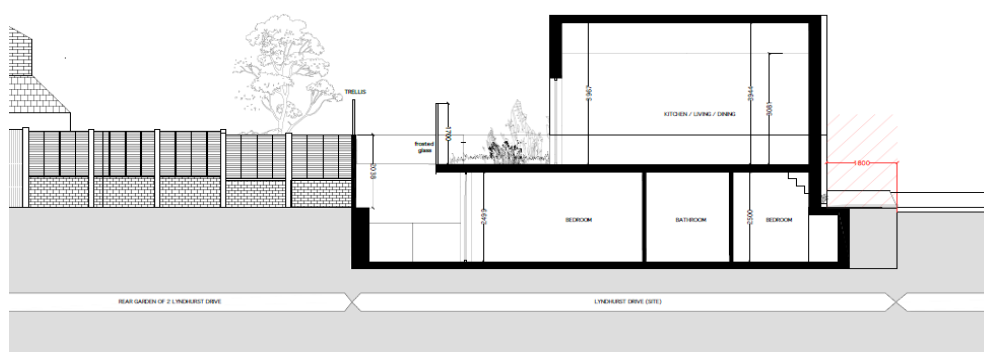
illustrates a section through the proposed dwellings, including the height and positioning of the boundary treatment. The drawing confirms that the fence reaches approximately 1.7 metres above ground level, which serves to screen views from the adjacent windows and outdoor areas. This arrangement demonstrates that direct overlooking into neighbouring plots would not be possible, thereby safeguarding privacy.
